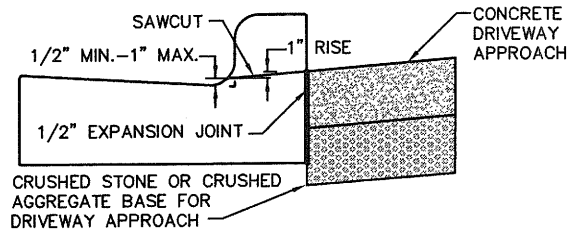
DETAILS & SPECIFICATIONS FOR DRIVEWAY & SIDEWALK CONSTRUCTION
